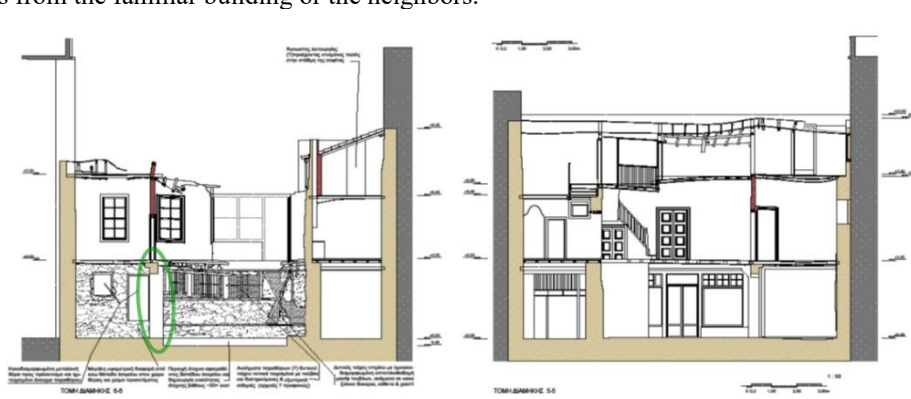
Longitudinal Sections of Terzaki, showing Ground floor, 1st floor, and Attic floor (B) (the green ellipse, on where the newer reinforced concrete beam and pillars had been put)
